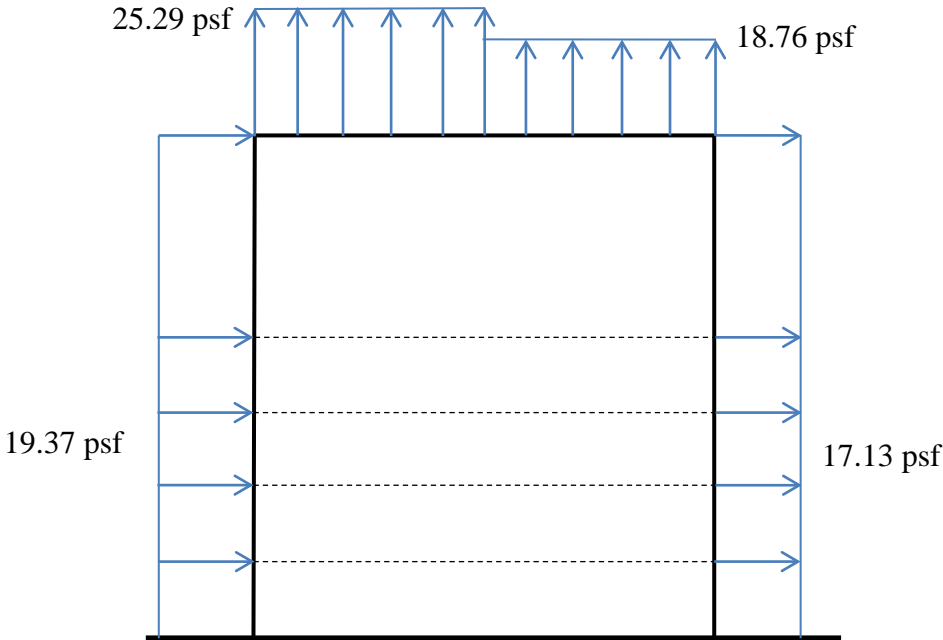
N-S and E-W wind pressures for the flat roof of the central core
